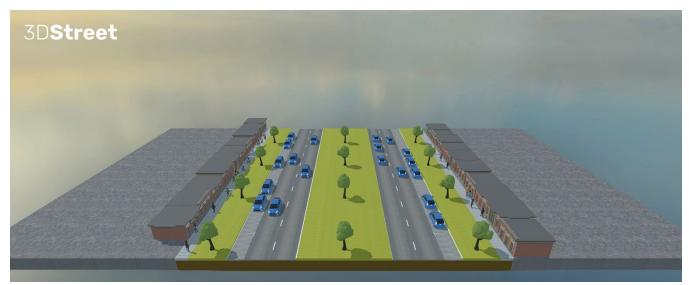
Mack Avenue: Existing Section, Plan, Perspective Views
